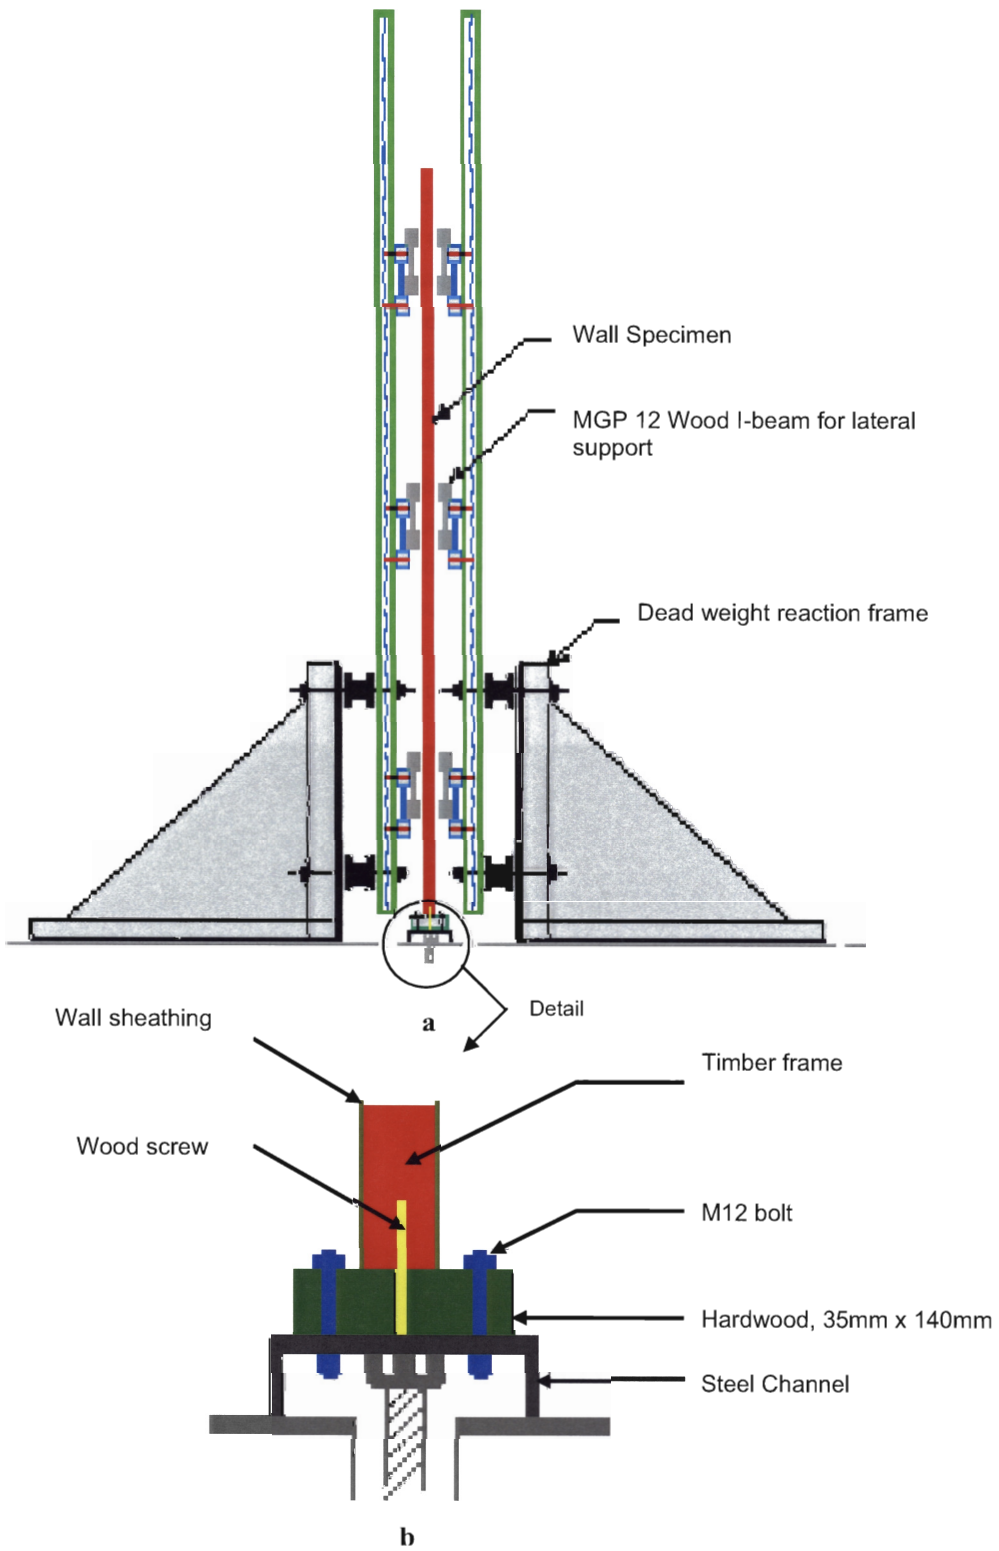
Schematic diagram of the wall test set-up; a. full set-up and b. enlarged view of the specimen's bottom.
